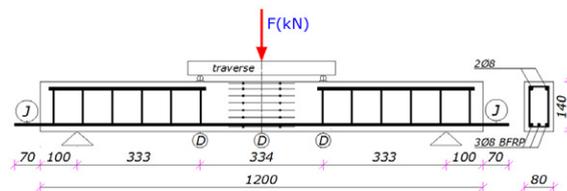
Concrete beam with bottom reinforcement (BFRP bars) with visible distribution of bench-marks used to measure the strain with an extensometer; J – slip measurement sensor; D – deflection measurement sensor, dimensions in mm
